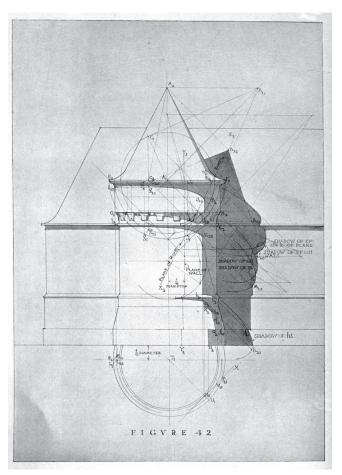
Henry McGoodwin, "Shades and Shadows on the Roof and Wall of a Circular Tower with A Conical Roof" from *Architectural Shades and Shadows*.
